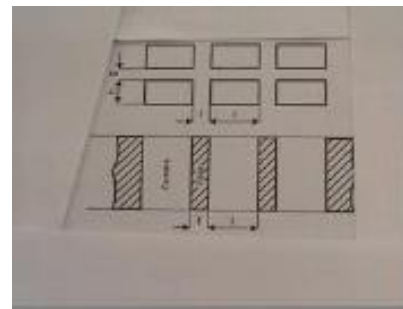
Horizontal section through the chamber-rectangular pillar system
